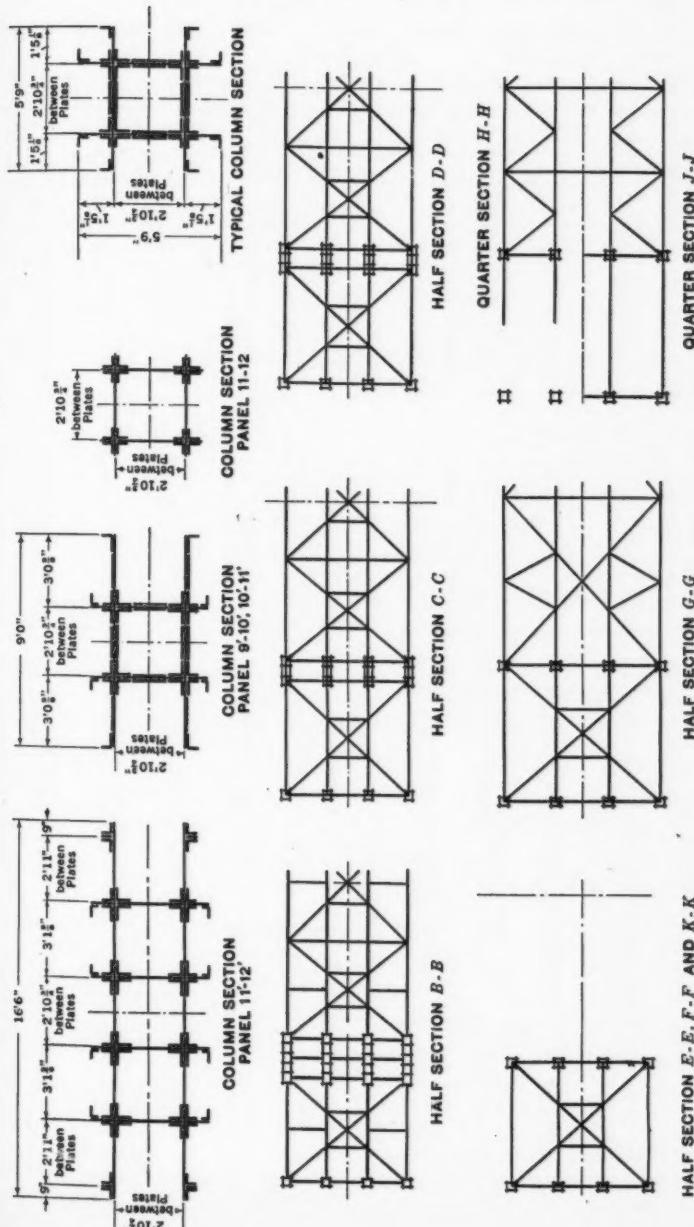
DETAILS AND SECTIONS OF TOWER (See FIG. 14).
